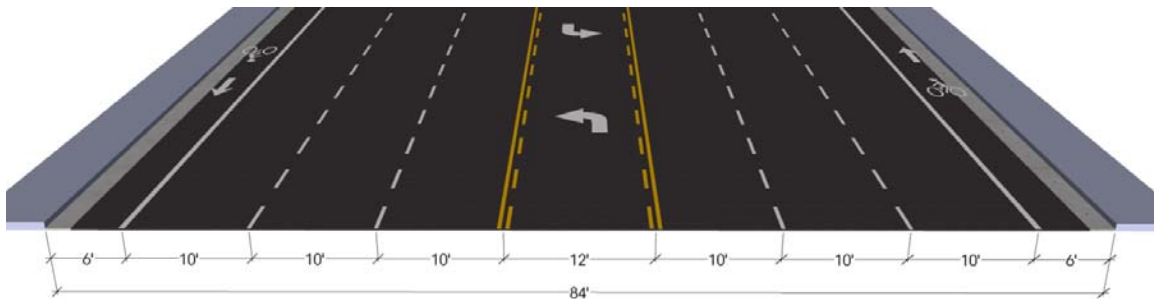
Plan View of Manhattan Beach Boulevard to 12th Street
